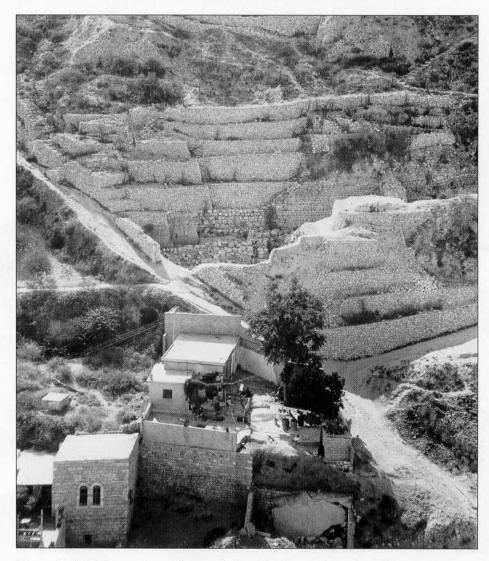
Retaining walls and houses built with stone in Jerusalem, Israel
